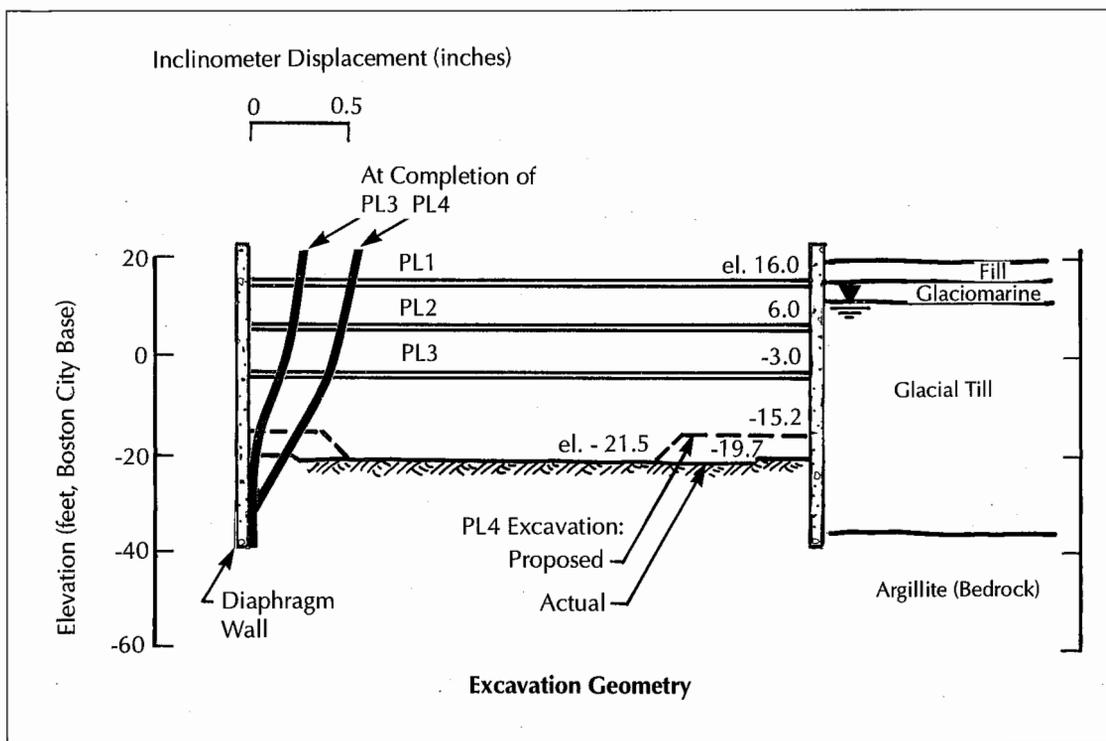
Below grade cross-section for the 125 Summer Street project.
